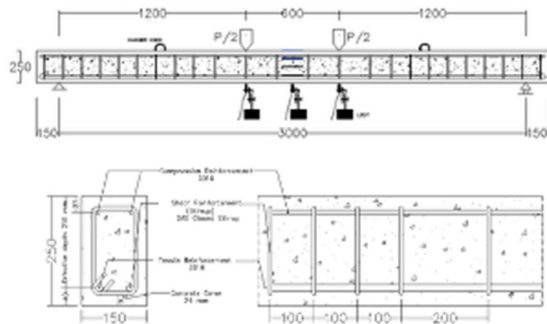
Beam geometry and cross-sectional detailing with exact dimensions and reinforcement layout.
